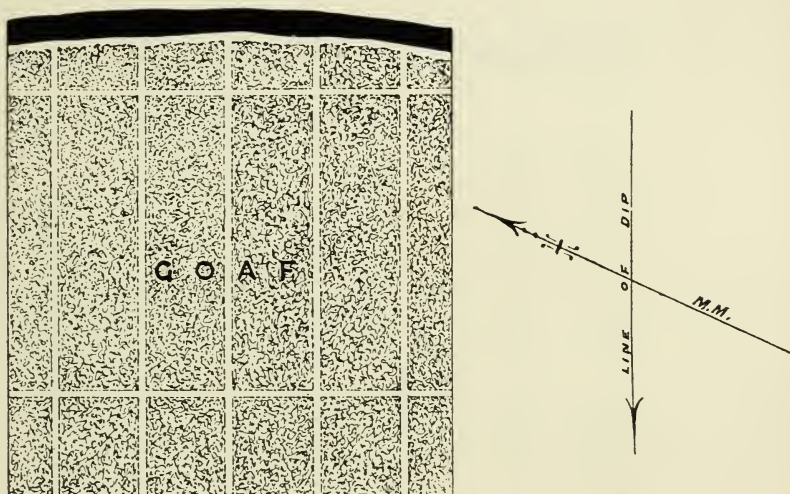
PEMBERTON COLLIERY, NEAR WIGAN, LANCASHIRE. PLAN SHOWING LONGWALL METHOD OF WORKING THE ORRELL FIVE-FEET COAL SEAM.
